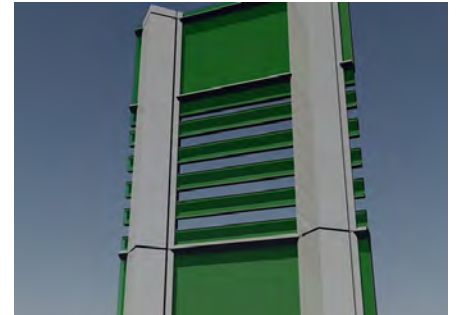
Wall Type 3 - Refuge Mechanical Wall
